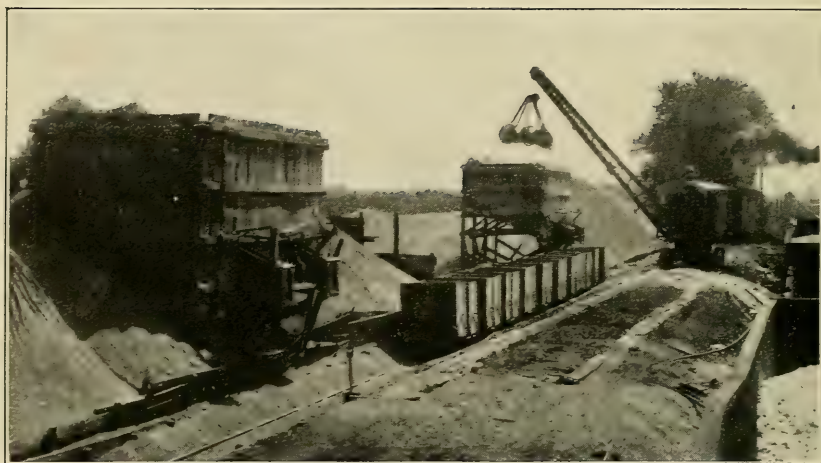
LOADING BATCH BOXES FROM OPEN BINS.
